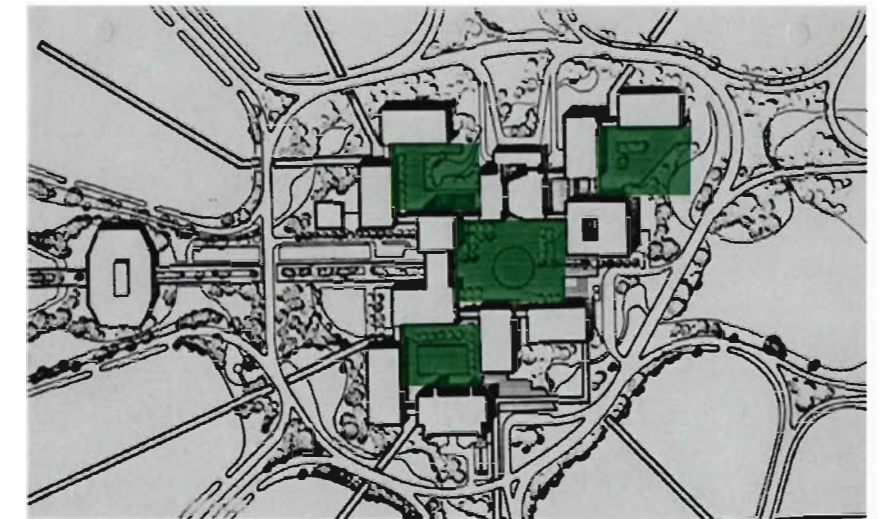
Master Plan illustrating central courtyard and instructional courtyards plans.
